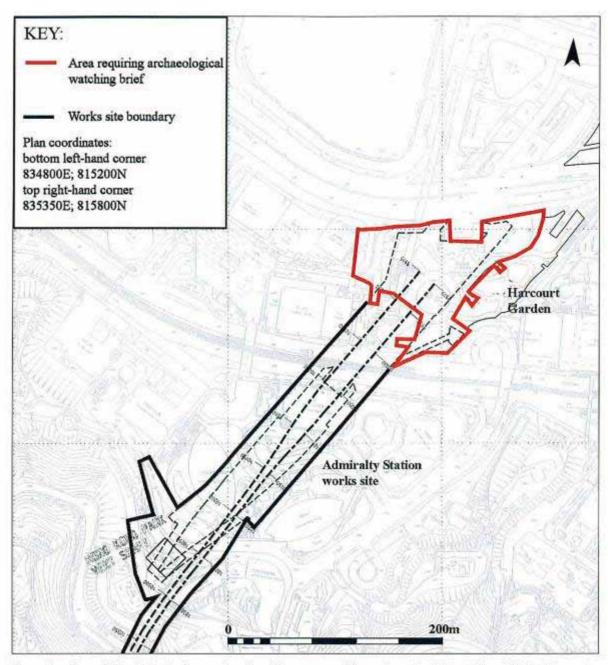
Plan of Admiralty Station works site with area requiring archaeological watching brief at Harcourt Garden outlined in red.
